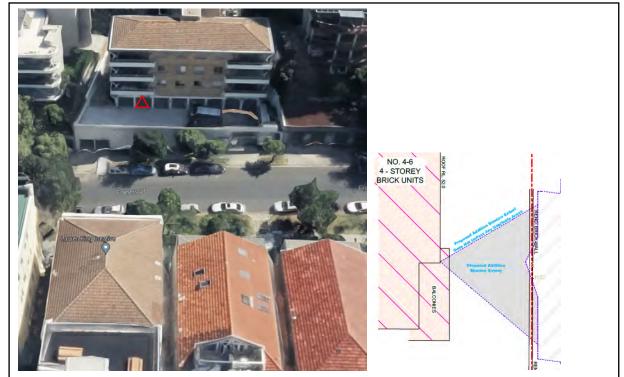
3D satelight image showling the likley location of were the proposed shadowing will cast on 4 Francis Street Bondi Beach (Source: Goole Maps, 2023 & iSA Designs, 2023)
